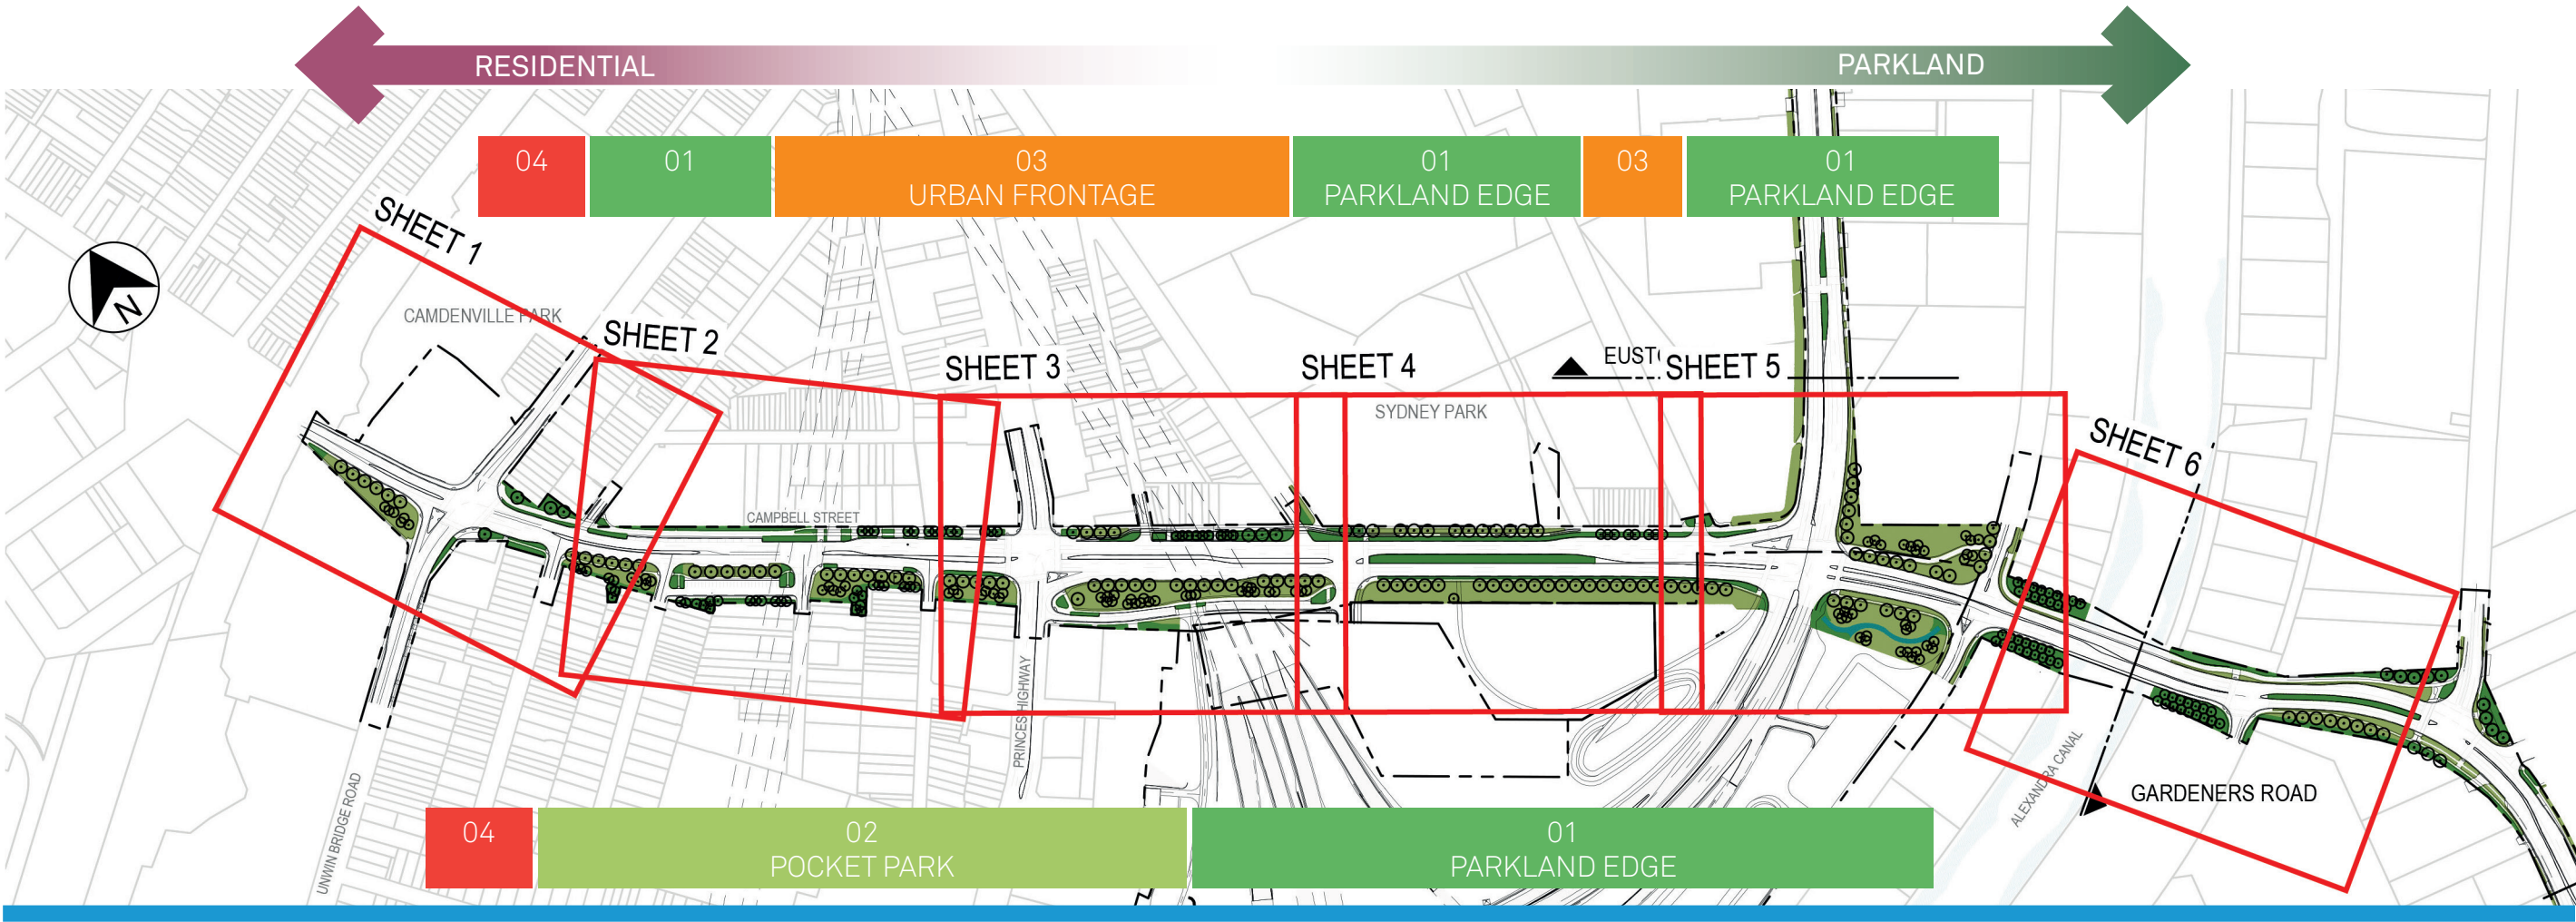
Campbell Street Green Link - Urban Design Concept Strategy - Plan
